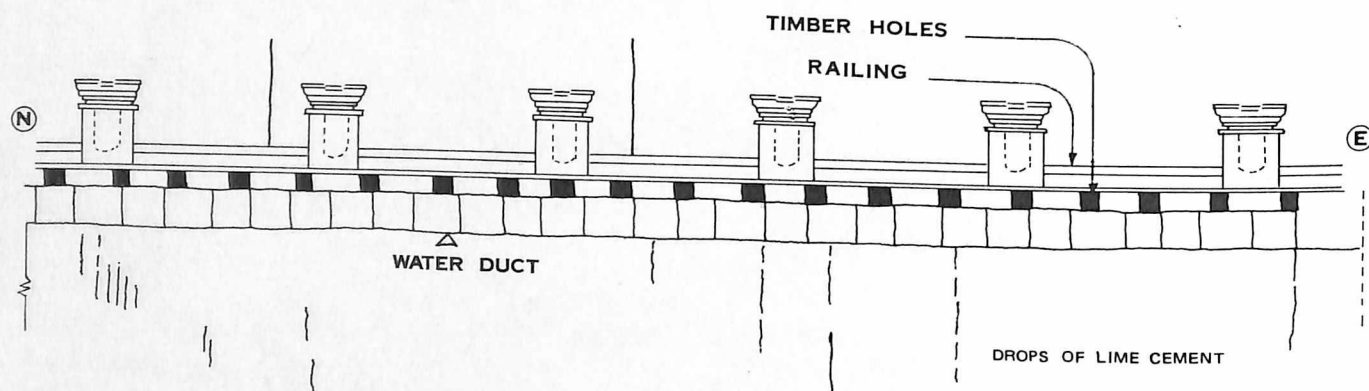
Drawing illustrates how the pillars and connecting beams would look if they were reconstructed. This drawing is based on existing evidences on the structure.
